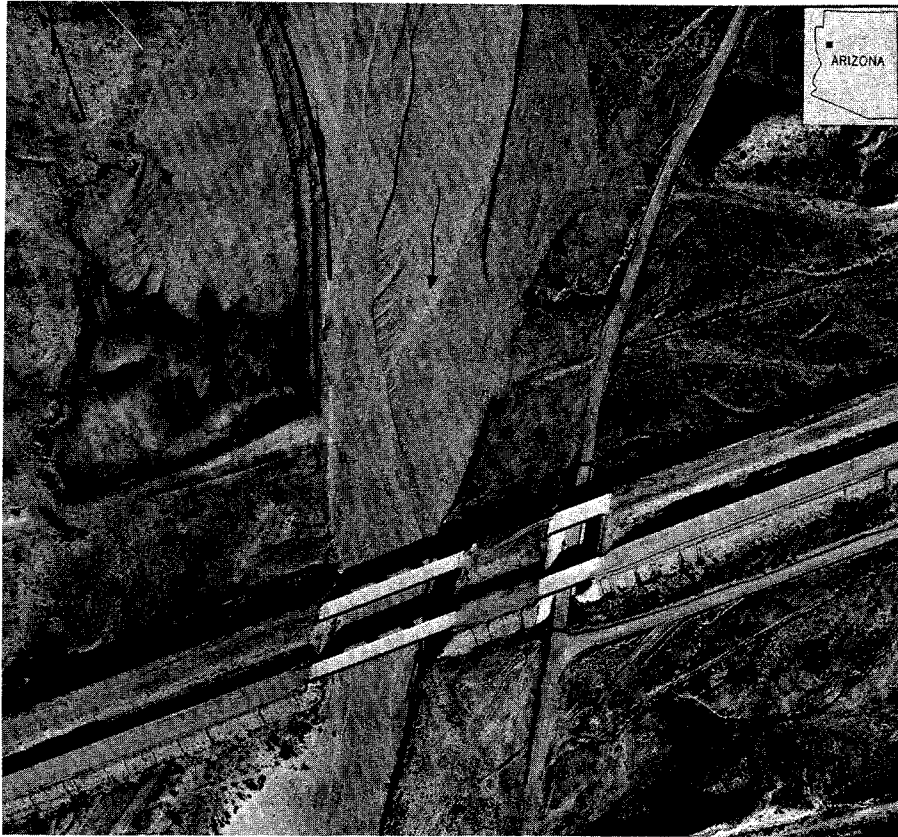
Aerial view of Big Sandy Wash at I-40 showing location of borrow pit on right bank upstream from bridge. Note lateral erosion of levee separating borrow pit from the channel and deposition of sediment at the upstream end of the borrow pit. (From Arizona Dept. of Highways, 1971.)
